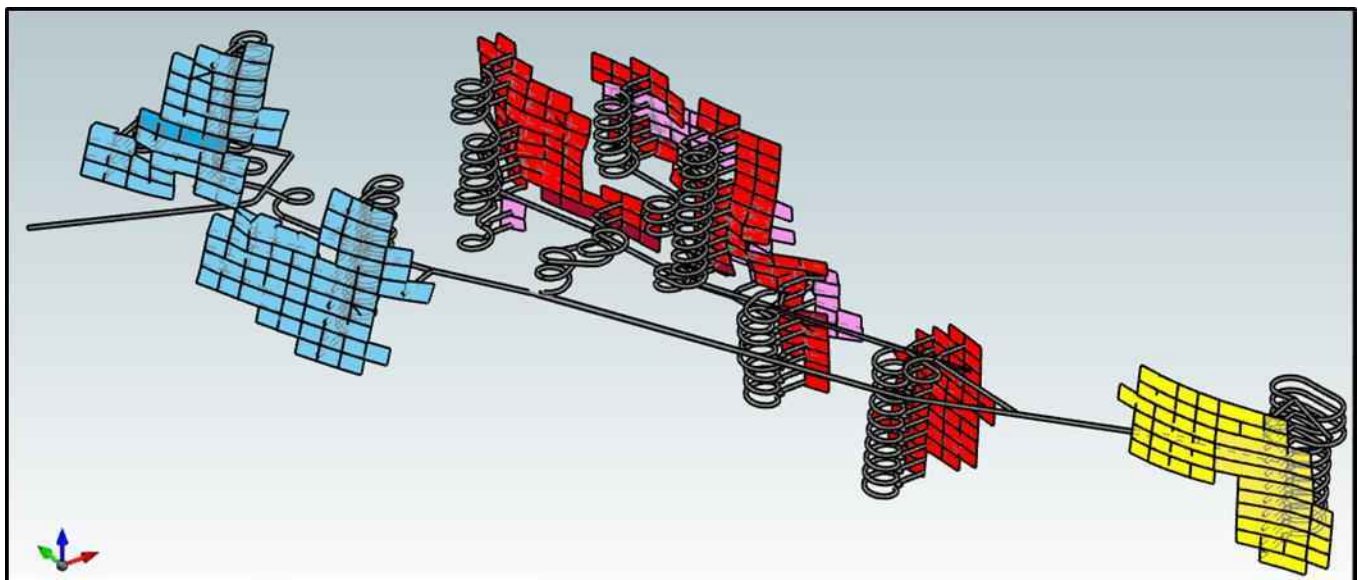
Las Chispas Development – Section View (Looking South)
